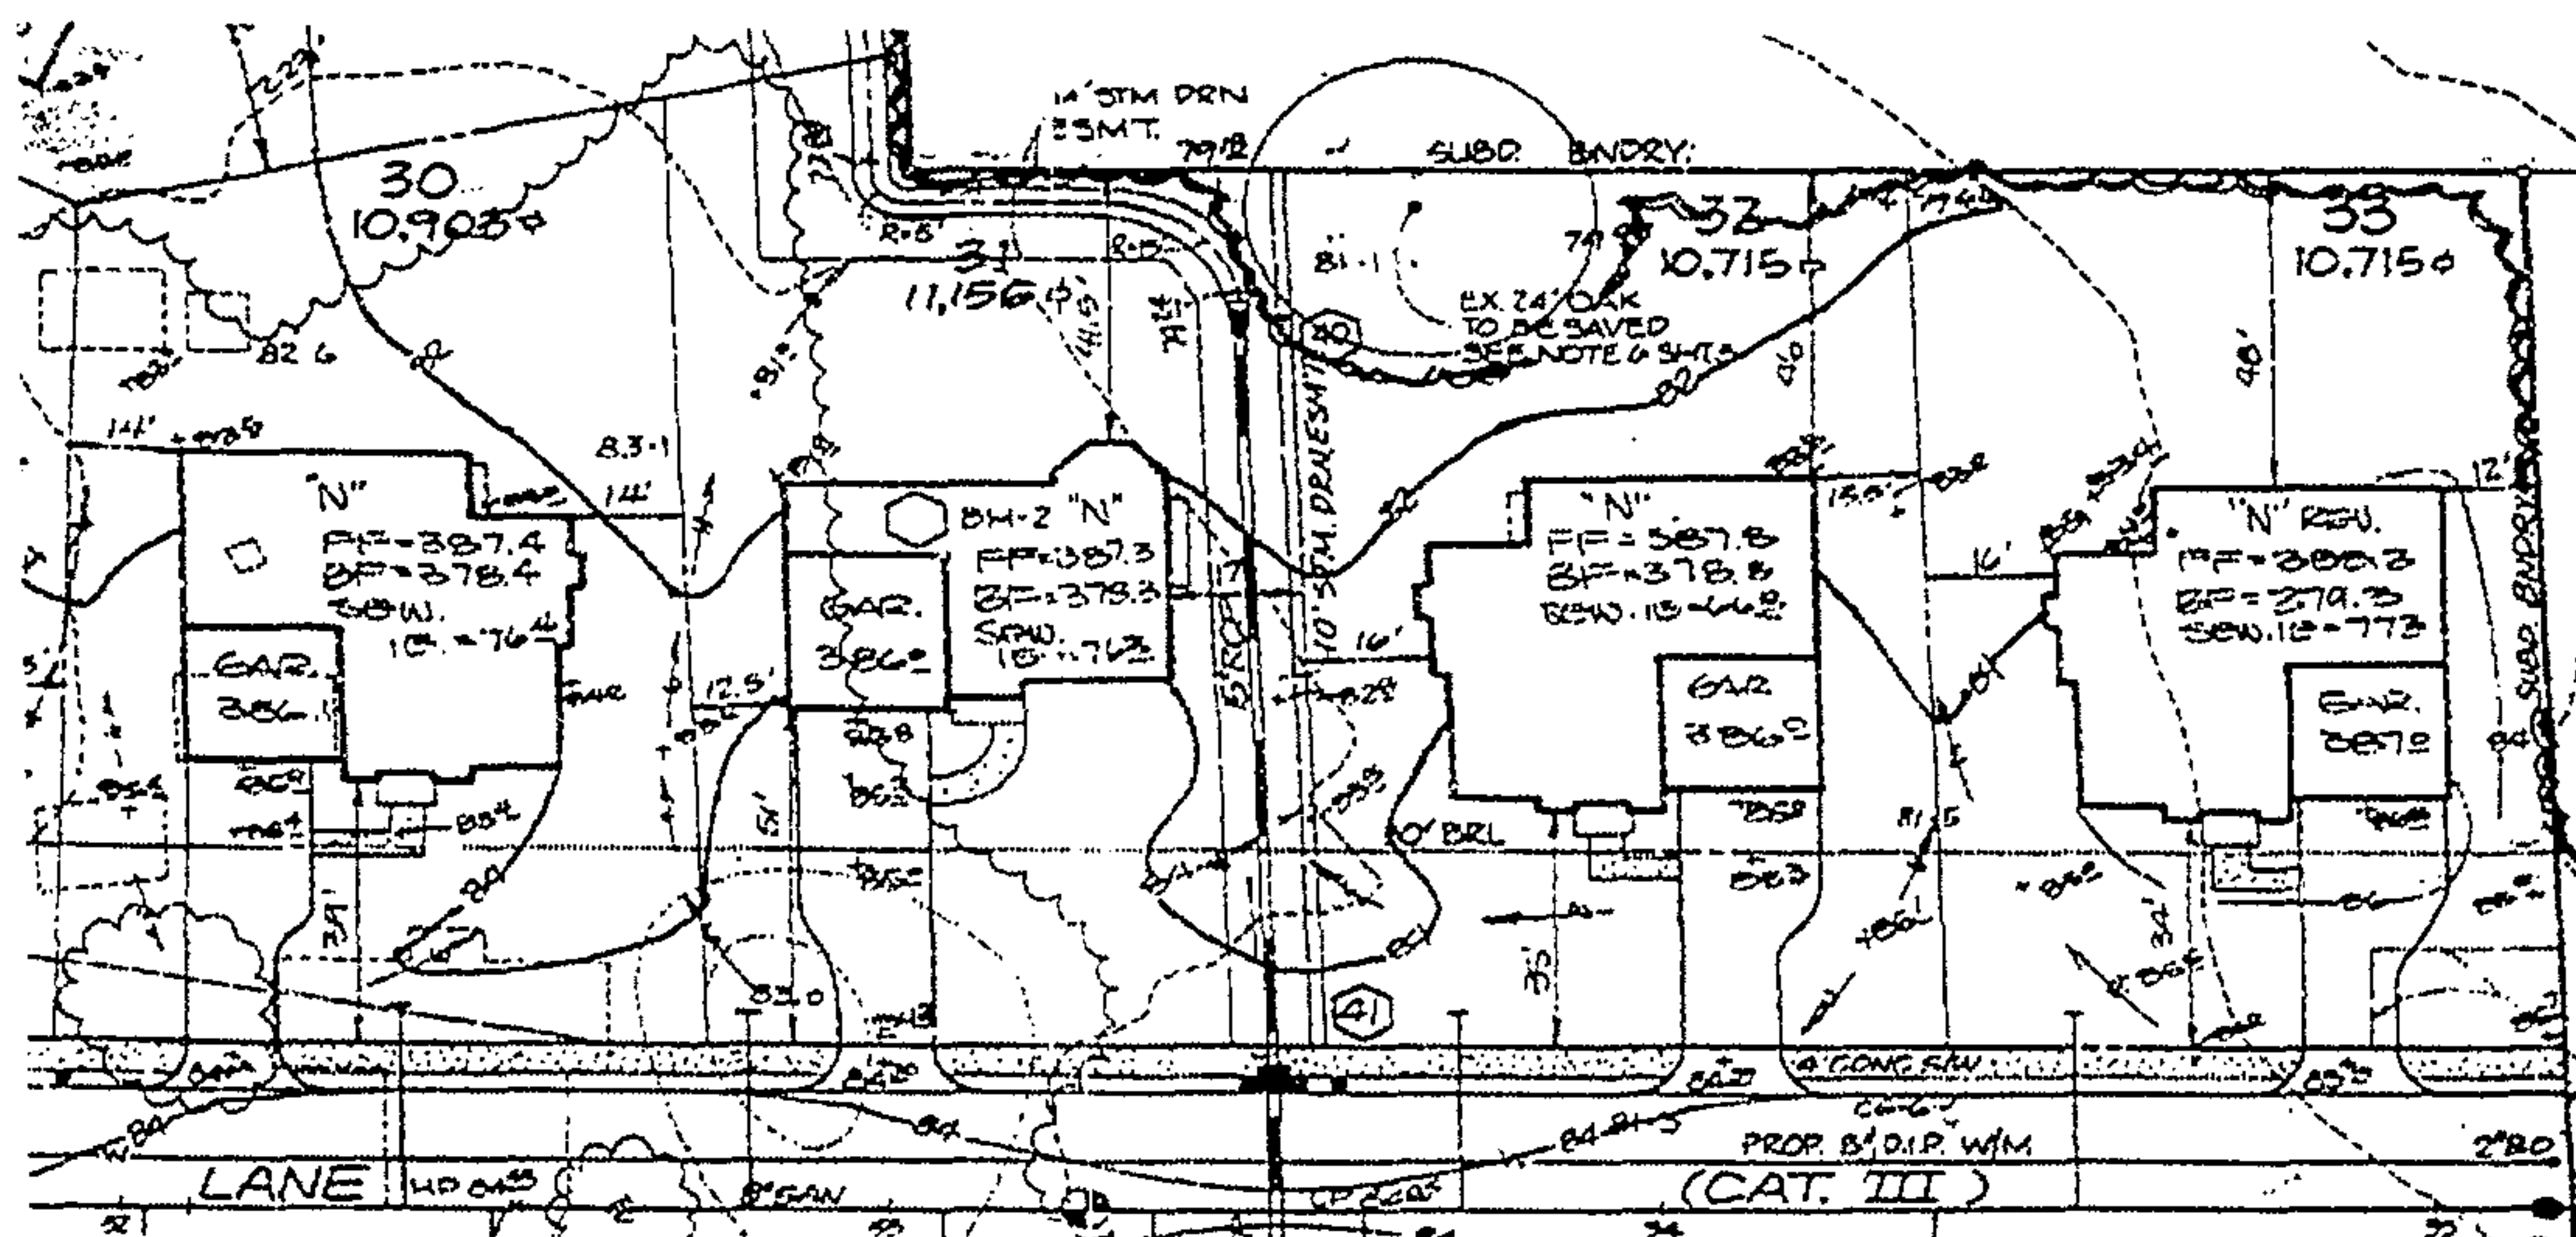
a SAMPLE DETAIL REQUIRED FOR OVERLOT GRADING PLANS
